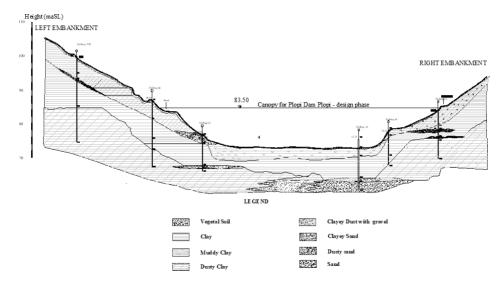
Longitudinal section through The Plopi Dam foundation ground
